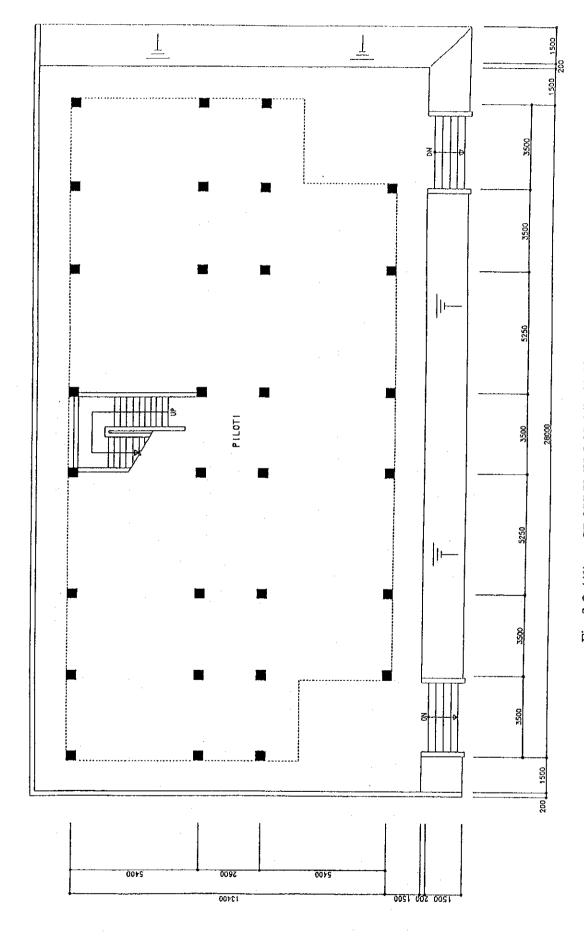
(1) GROUND FLOOR PLAN (5-CLASROOM TYPE)
